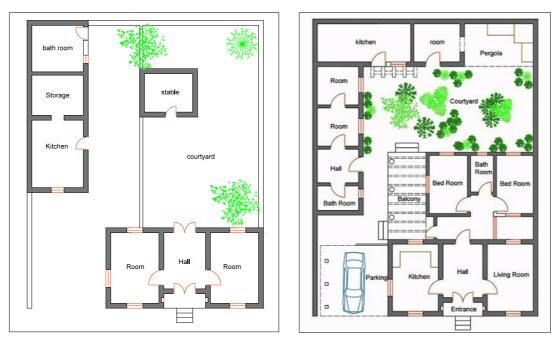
Original and adapted plan of the house (Author, 2012)
